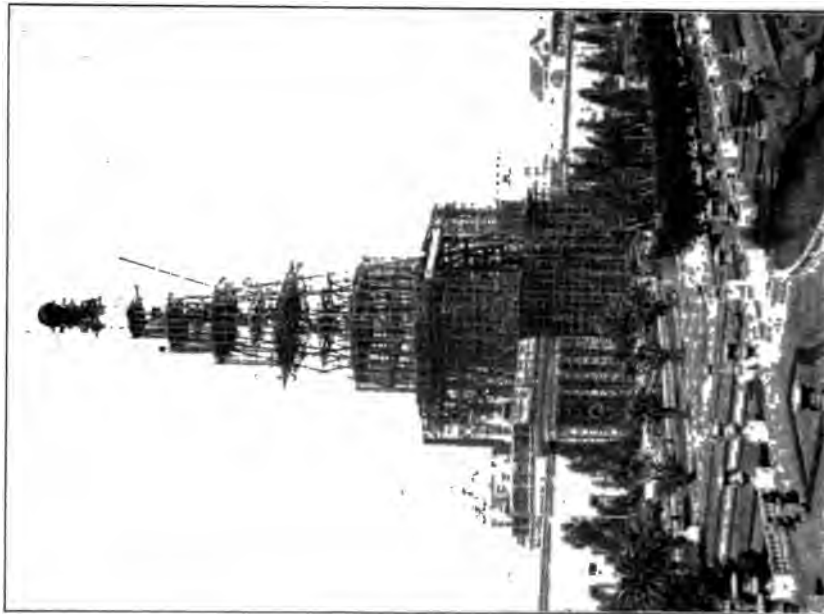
TIMBER FRAME OVER STEEL FRAME TOWER
